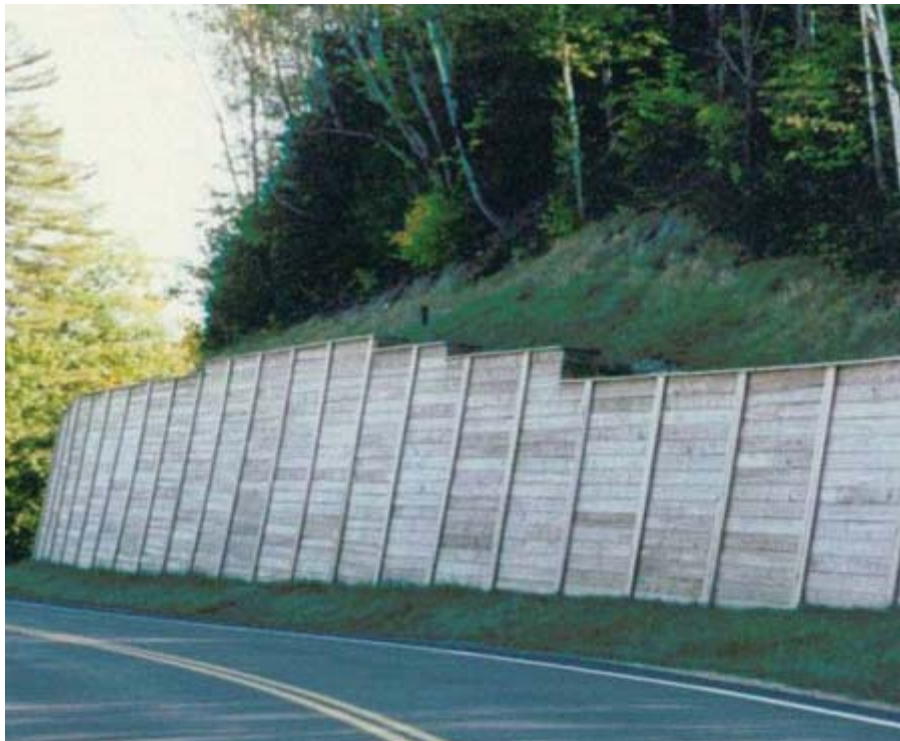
Photo. Timber-faced soil nail wall. (Courtesy New Hampshire DOT)
